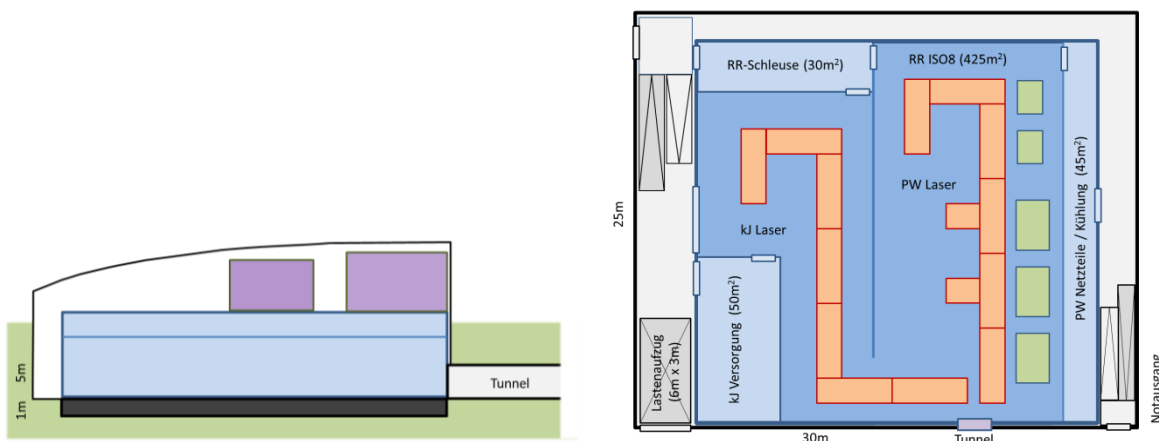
Side view of the underground levels of the proposed laser building which does not yet incorporate additional office space in potential upper floors (left). Foot-print of the clean-room laser lab showing examples of PW and kJ laser table installations (right).
